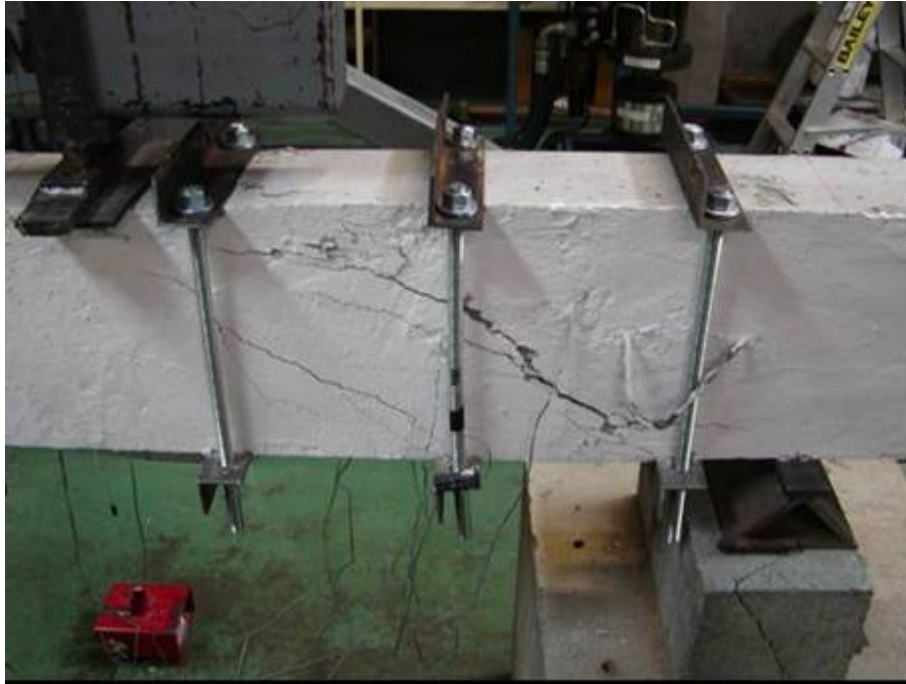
Shear cracks appeared in the specimens with external clamping (Right hand side end of beam is shown)
